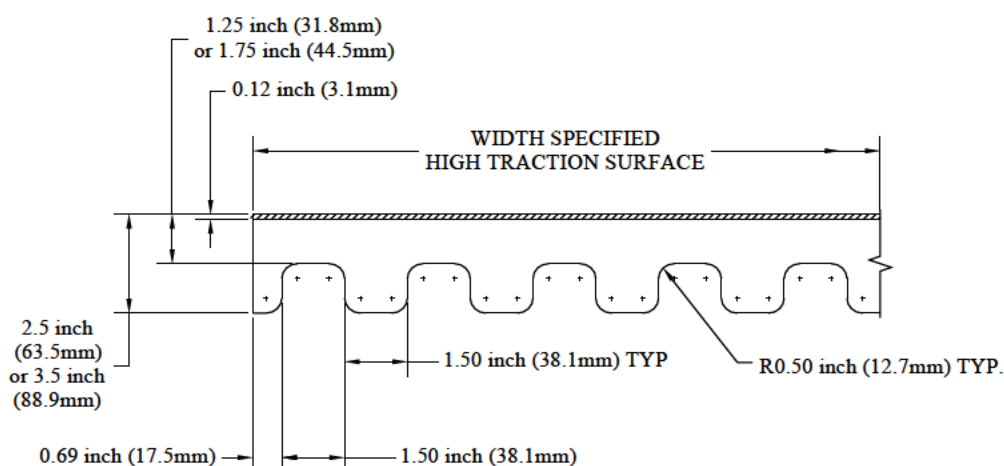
Typical synthetic decking M-shaped cross section (dimensions are nominal).
